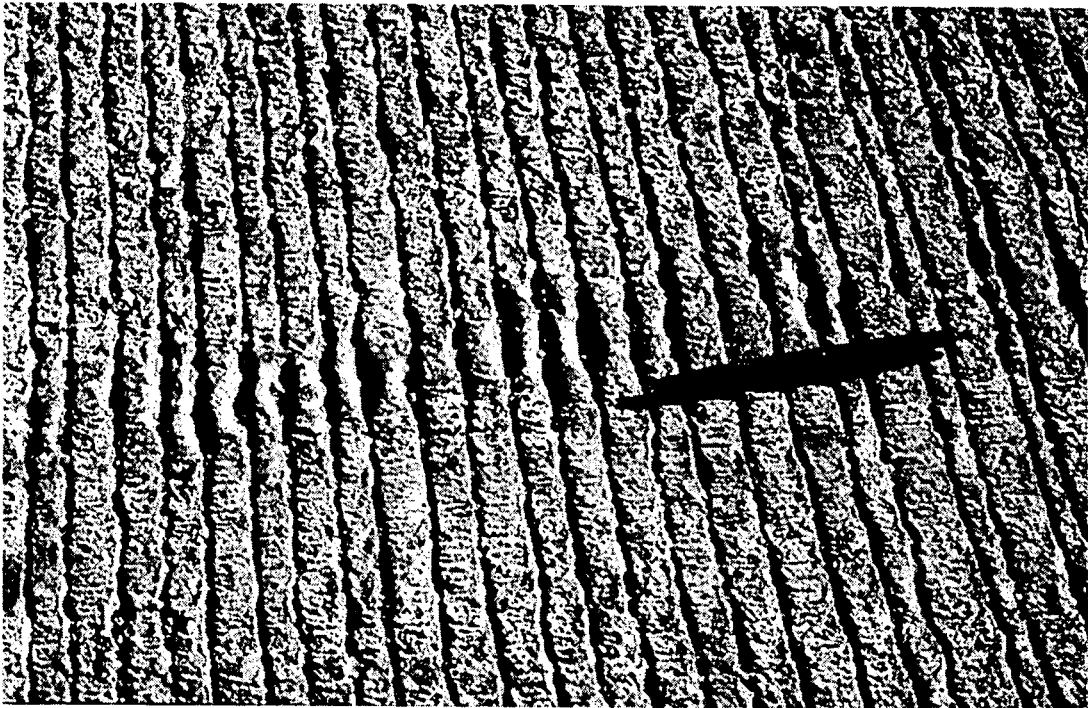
Distortion of pavement surface in a vibrator trail.
